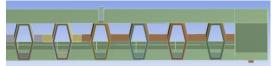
Beam model with Hexagonal folded web plate of one exterior stiffener
